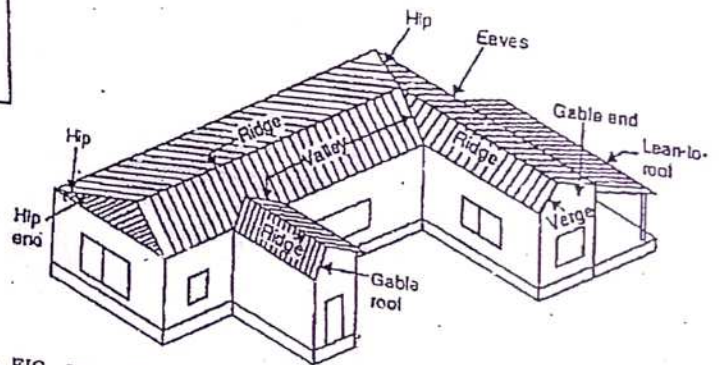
VIEW OF A BUILDING WITH BASIC SLOPING ROOFS.
